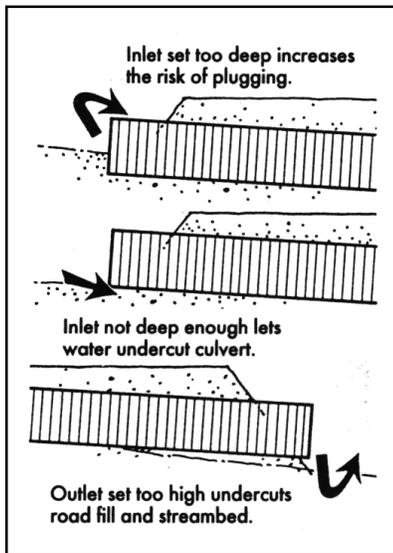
Proper installation of culvert in the stream is critical to preventing plugging or undercutting (Montana State University, 1991).
